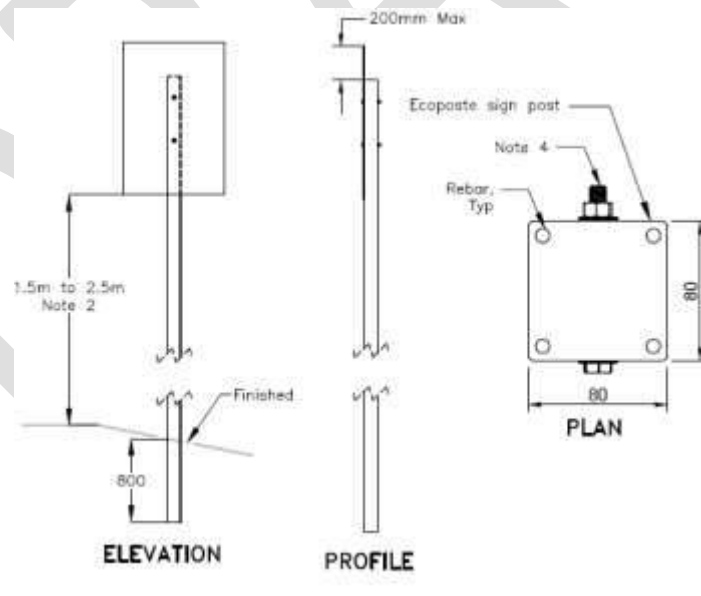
XX: Single Post Assembly of EcoPoste Collapsible Support Breakaway System
